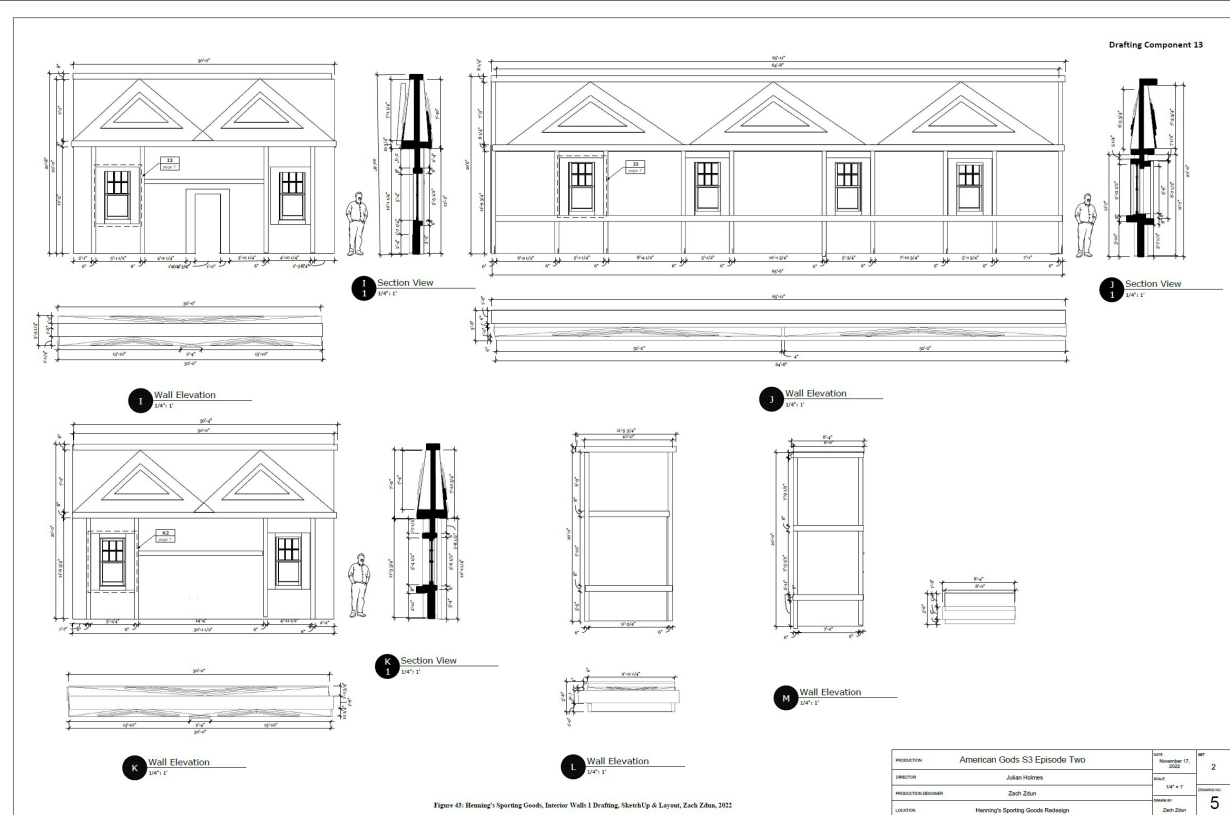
Henning's Sporting Goods, Interior Walls 1 Drafting, SketchUp & Layout, Zach Zahn, 2022
